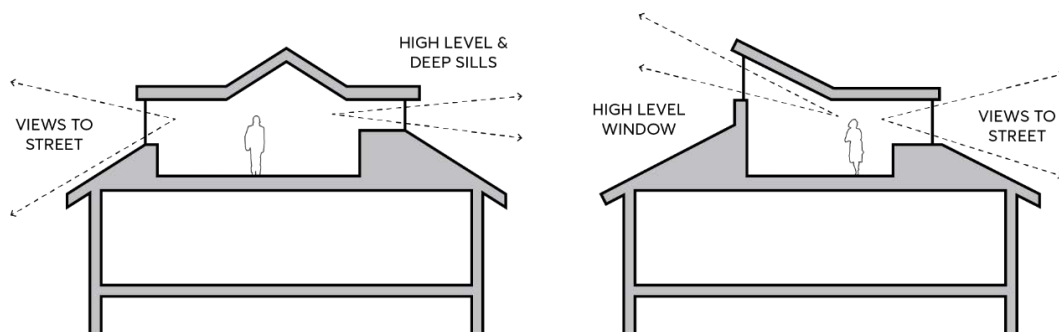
Attic windows designed to enhance privacy and cross ventilation
